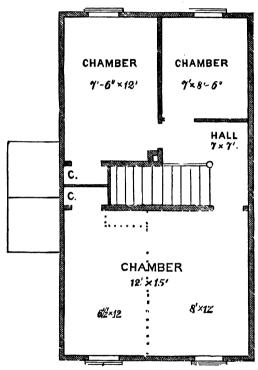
SECOND STORY.—Scale, 8 feet to 1 inch.
